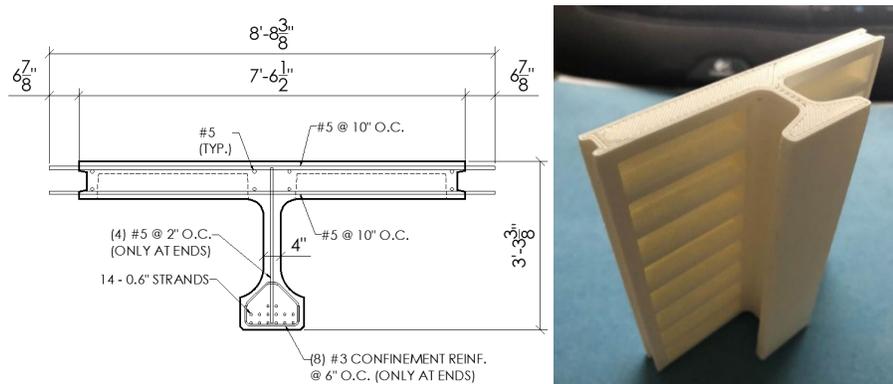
Full-Scale UHPC DIB Tested, cross-section (left), 3D printed model shows waffle slab (right)
